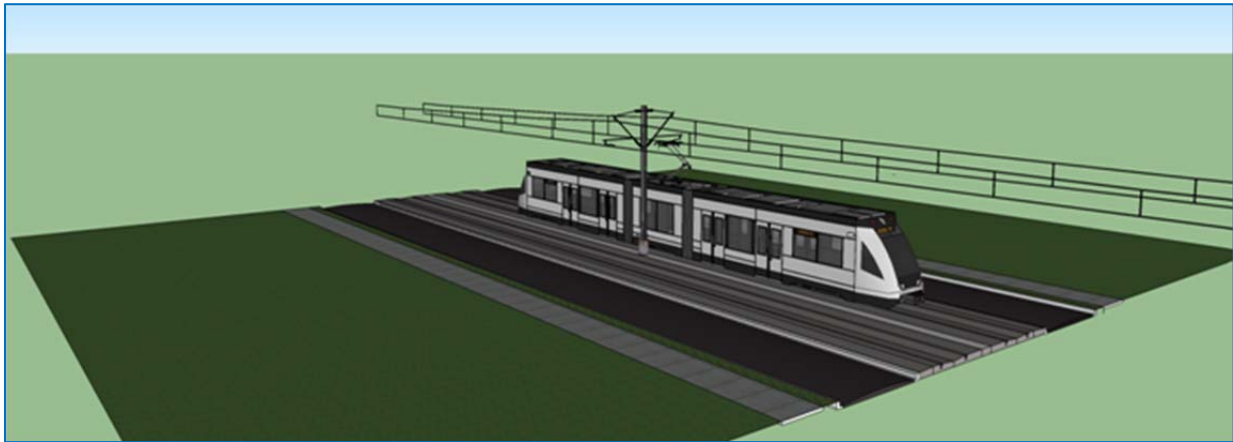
| Ballasted Track Section (along former NSRR ROW)
